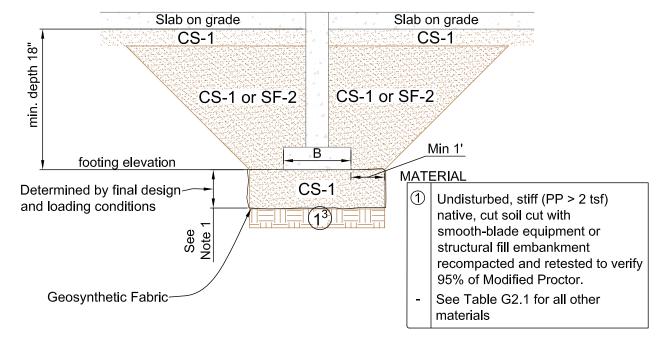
Soil Improvement Schematic - Column Foundations (Interior)
